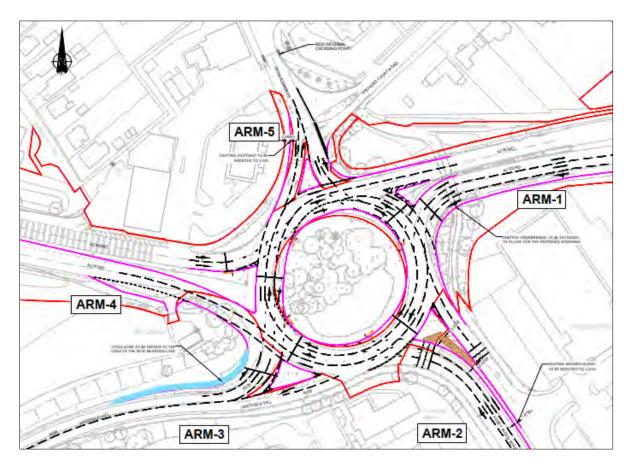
2D Geometry layout of Design of Whitfield Roundabout
